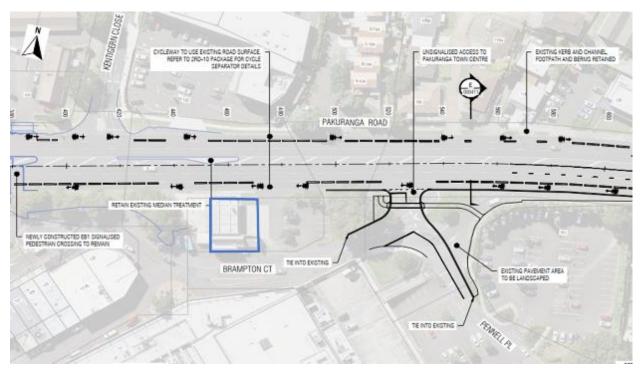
141 Pakuranga Road (blue outline) upon completion
